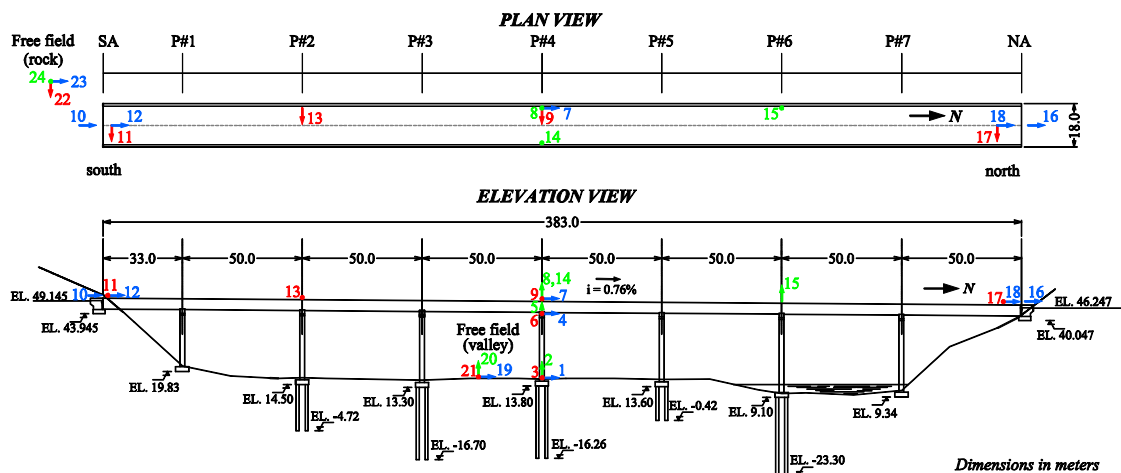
Plan and elevation views of the instrumented Marga-Marga Bridge, located in the city of Viña del Mar, Chile.
